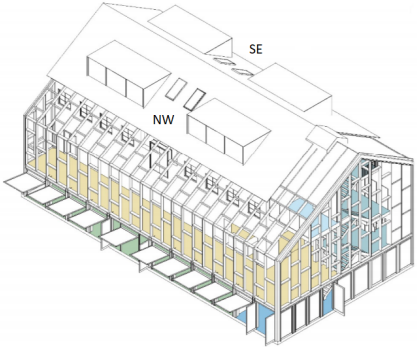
Concept building showing the roof, windows and orientation of the building [11, p. 14].
